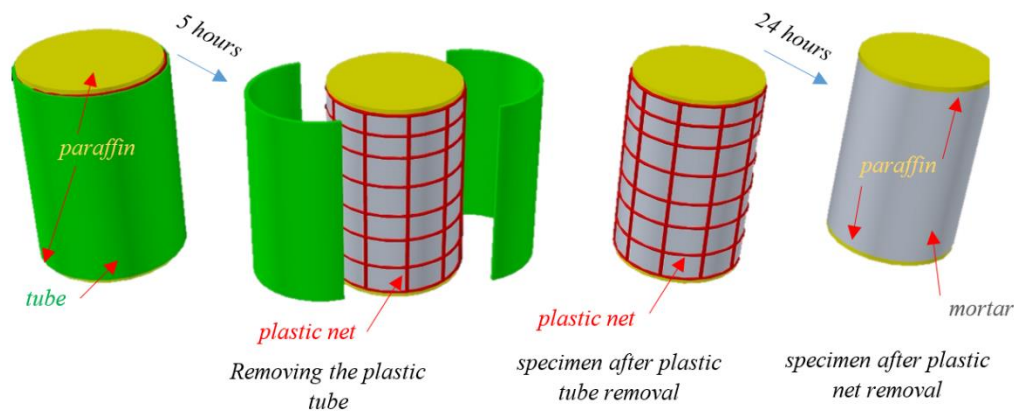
Casting of cylindrical specimens - tube + plastic net
